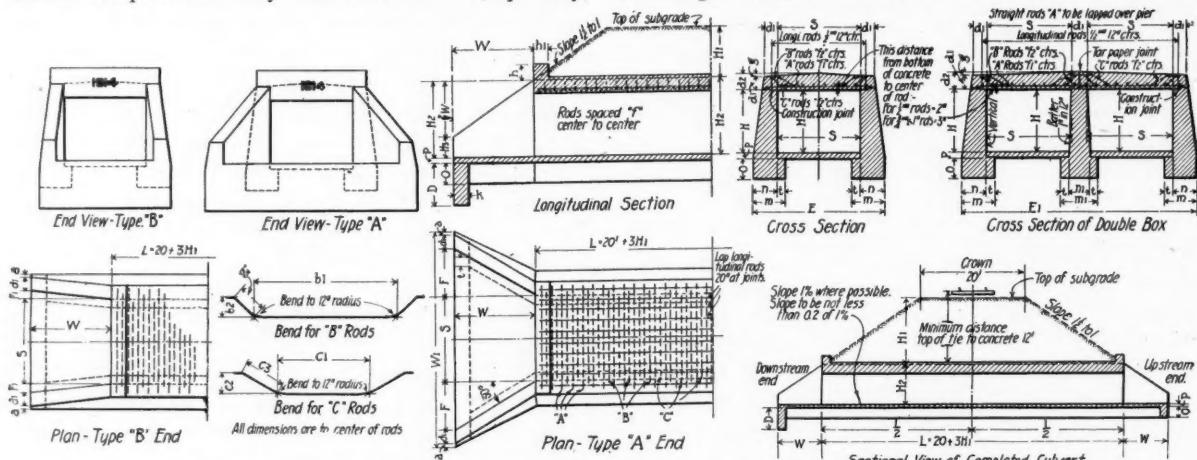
Detail Plan for Standard Reinforced Concrete Box Culverts, St. L. & S. F. R. R.
